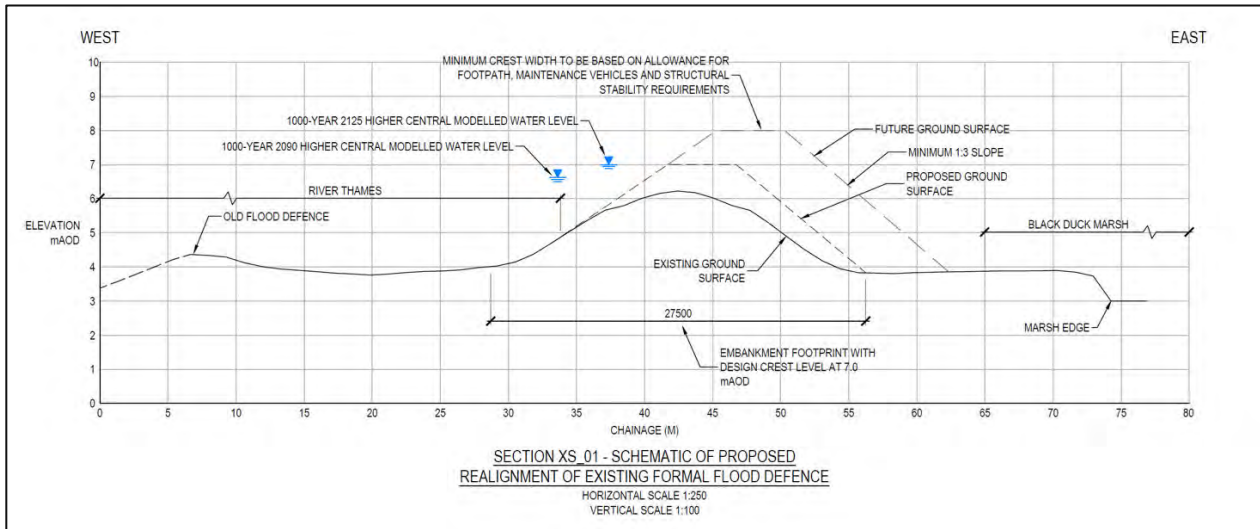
Black Duck Marsh cross section showing the proposed initial and phased defence crest level raising, cross section location shown on the plan in Figure 4 -11
